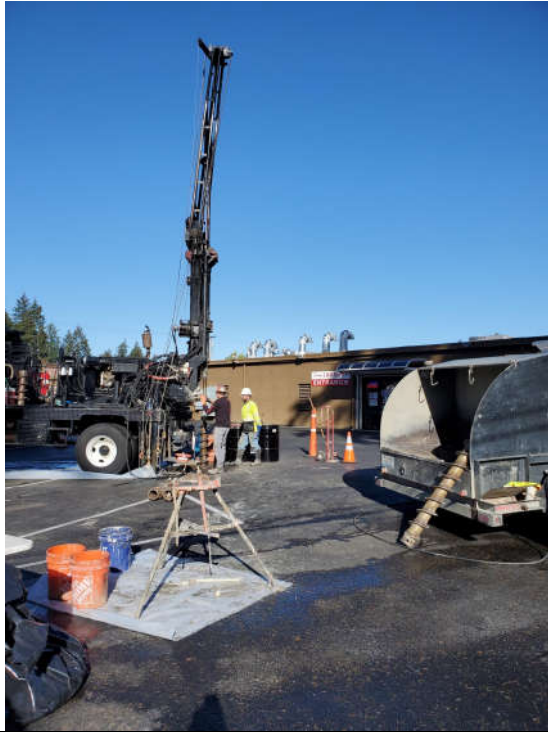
Installation of monitoring well MW-5 facing northeast.
